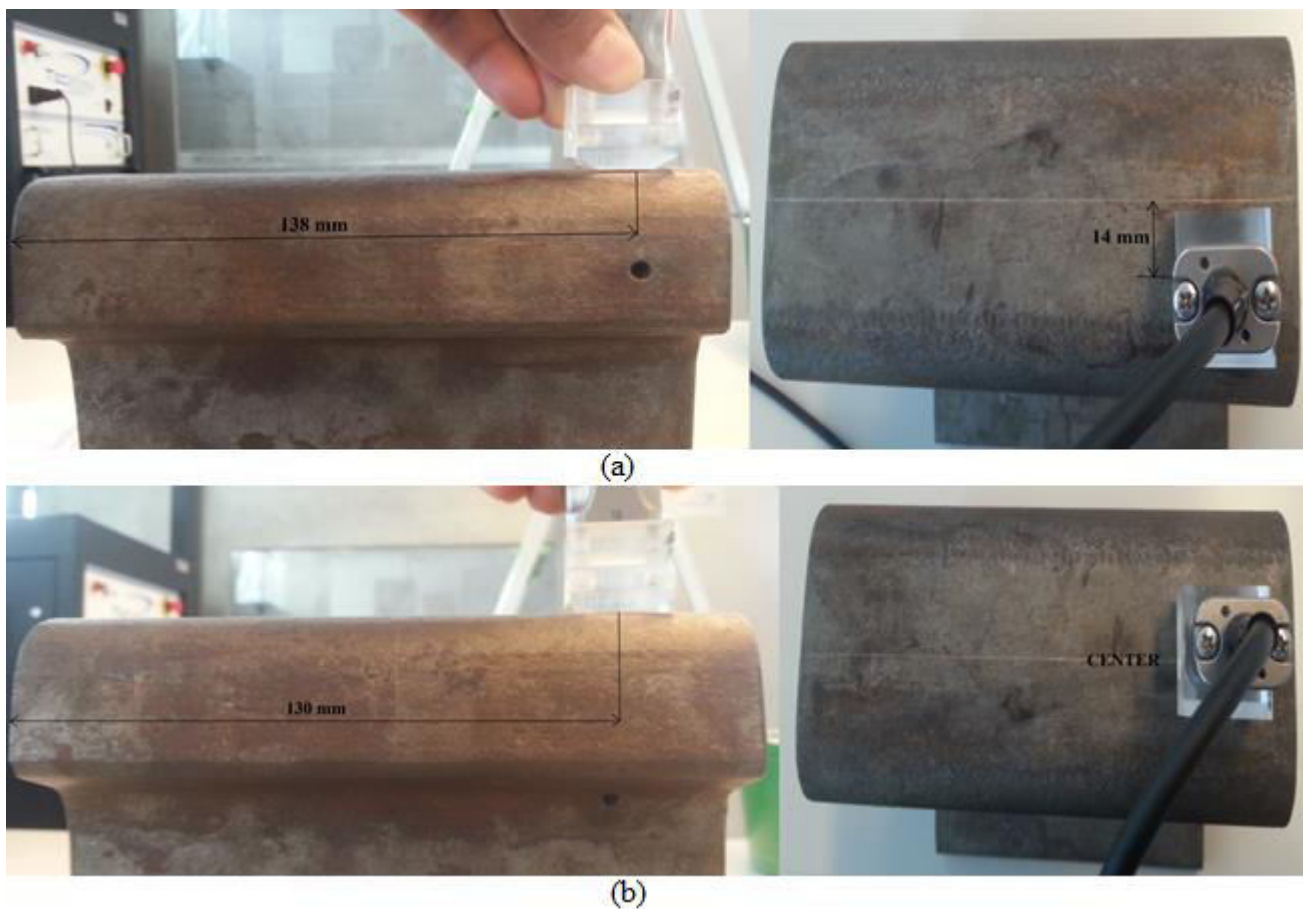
Position of PA2 (Wedge-1) on the test sample (a) for inspecting defect-1
